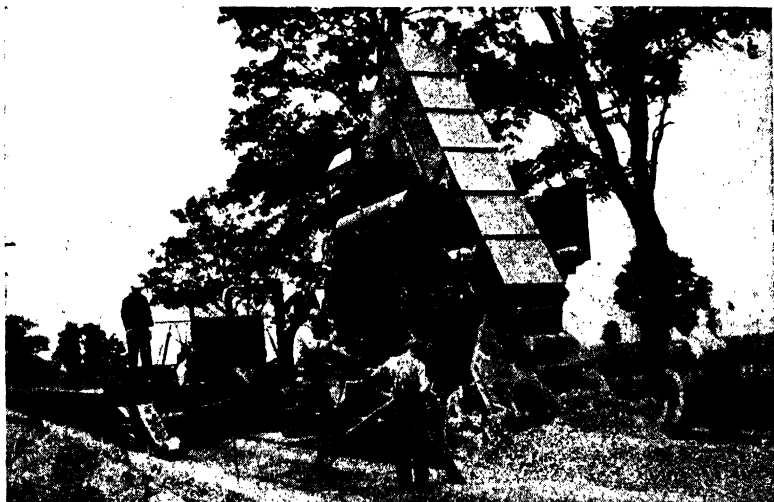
One type of road-mix machine combined with a spreader and tamper.
